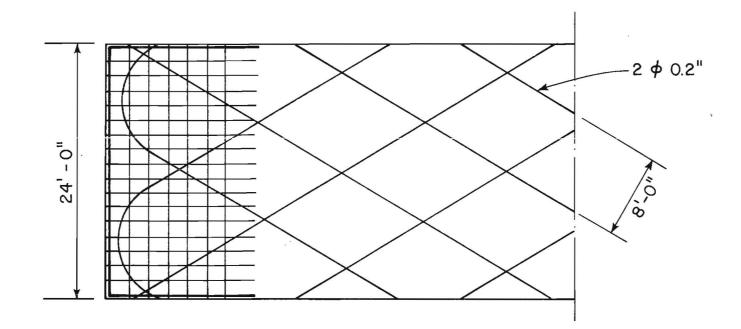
ARRANGEMENT OF TENDONS IN PRESTRESSED PAVEMENT AT CRAWLEY, ENGLAND
